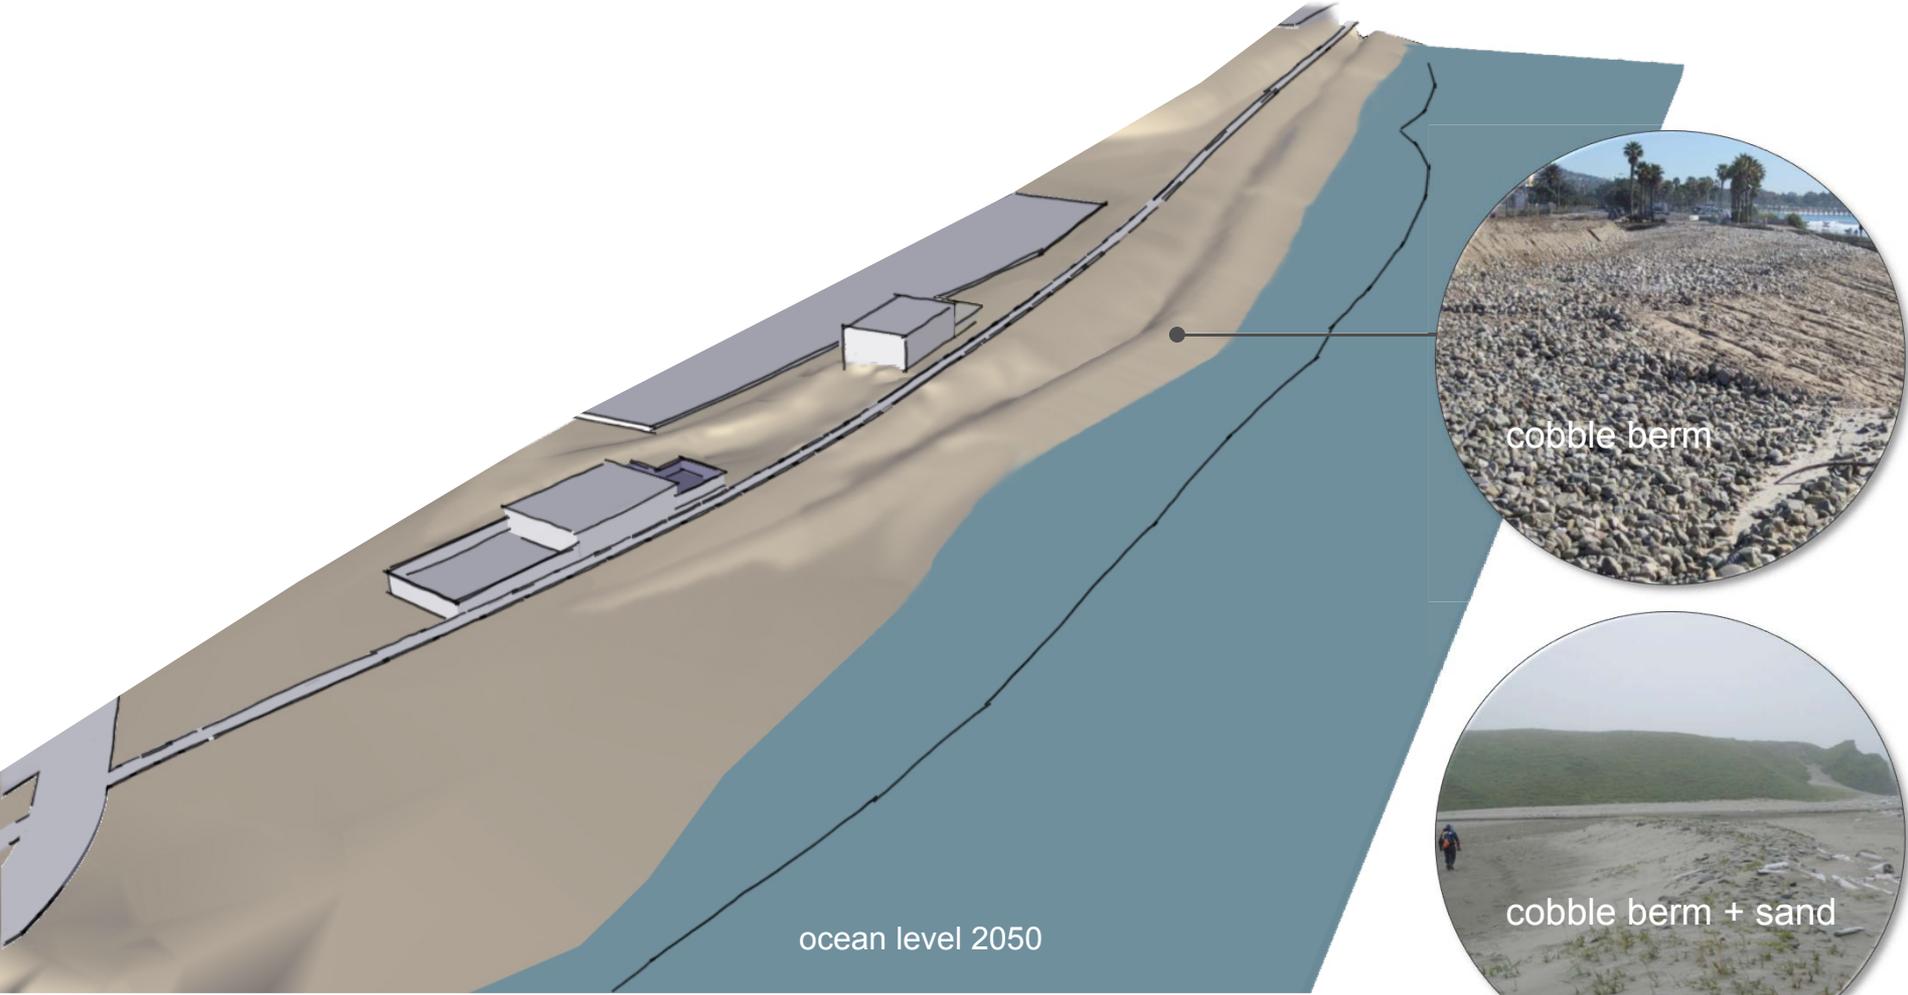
Ocean Beach Master Plan Presentation: Draft Recommendations
